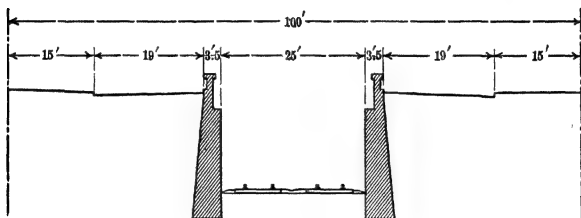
Open cut for double-track rapid-transit railroad in street 100 ft. wide; to be converted into a tunnel when necessary.
